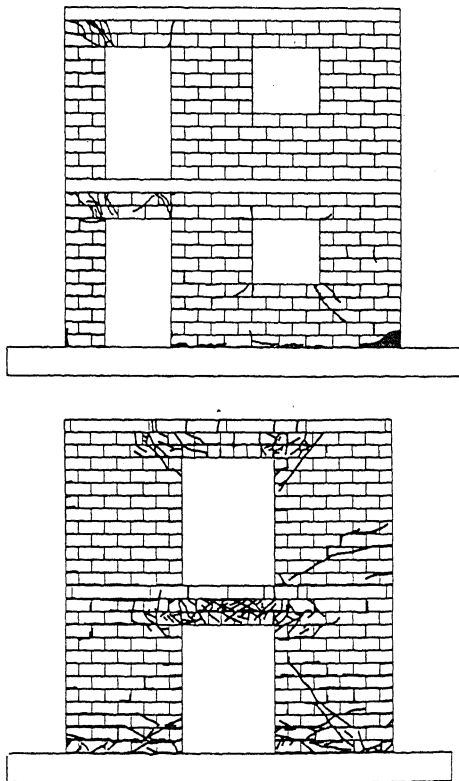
Typical damage patterns for Type 1 and Type 2 specimens
